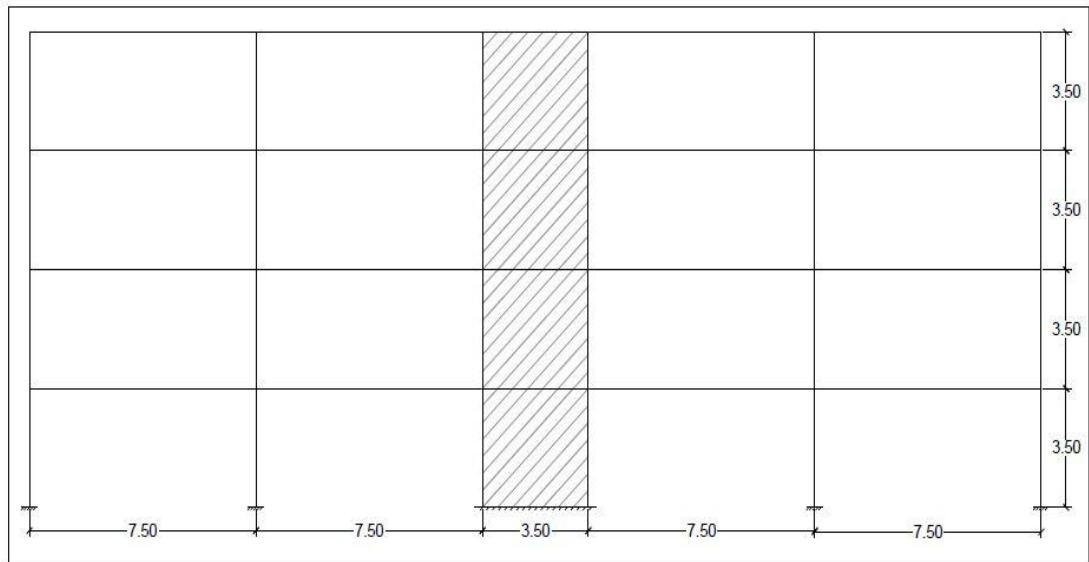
Elevation of 4-story building with steel plate shear walls having different plate thicknesses
